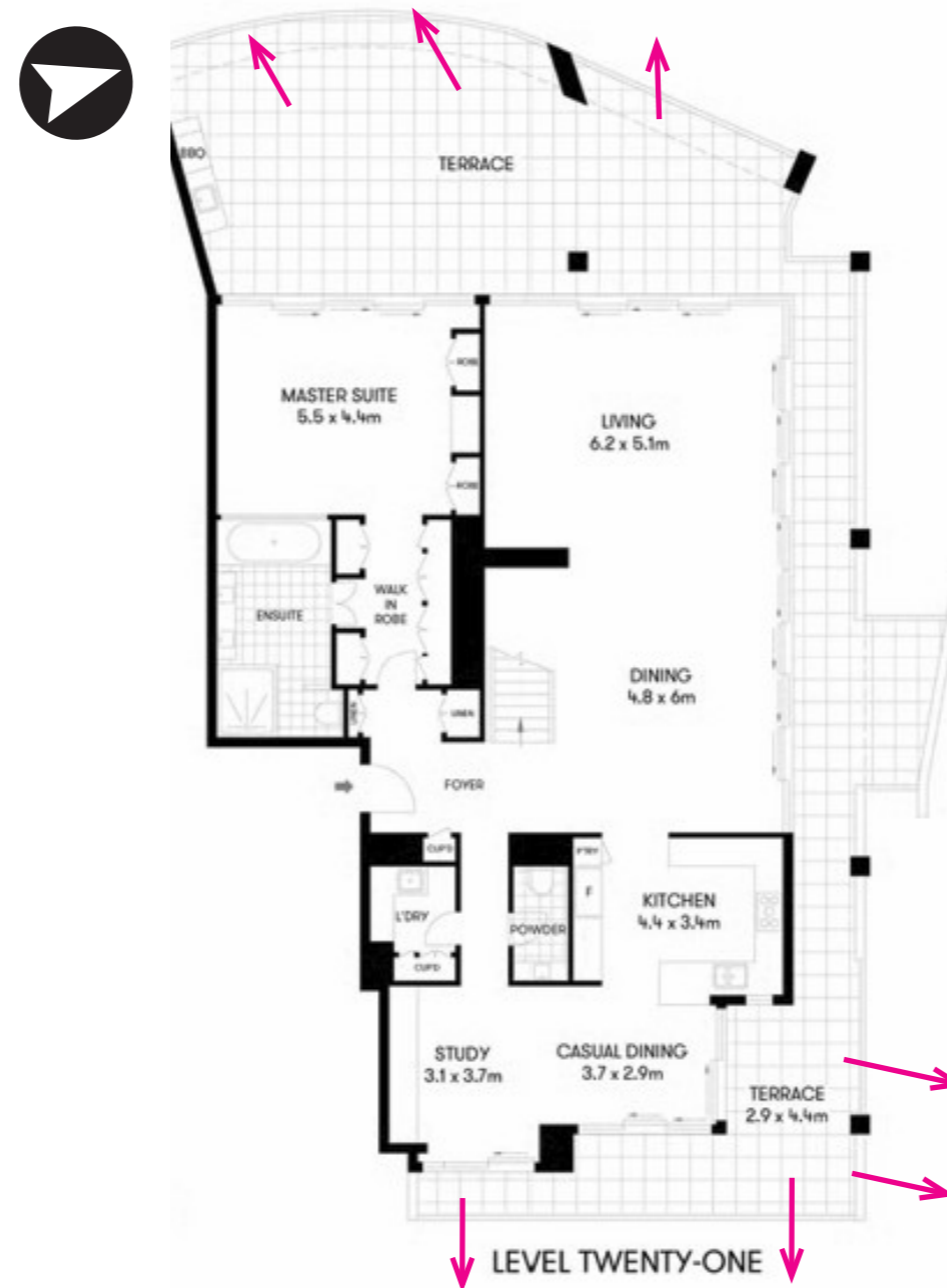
Example floor plan from Blue at Lavender Bay (61 Lavender Street), unaffected views indicated in pink
